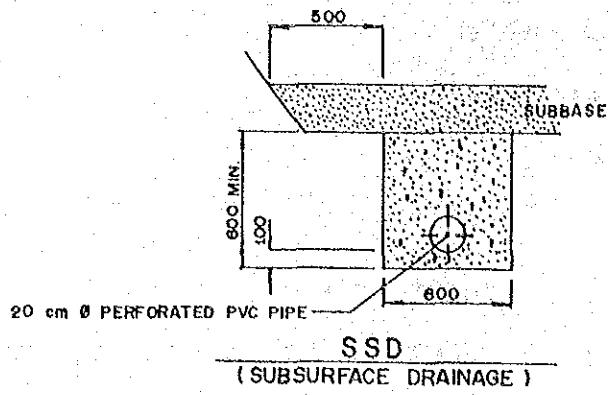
TYPICAL CROSS-SECTION OF SUBSURFACE DRAINAGE
